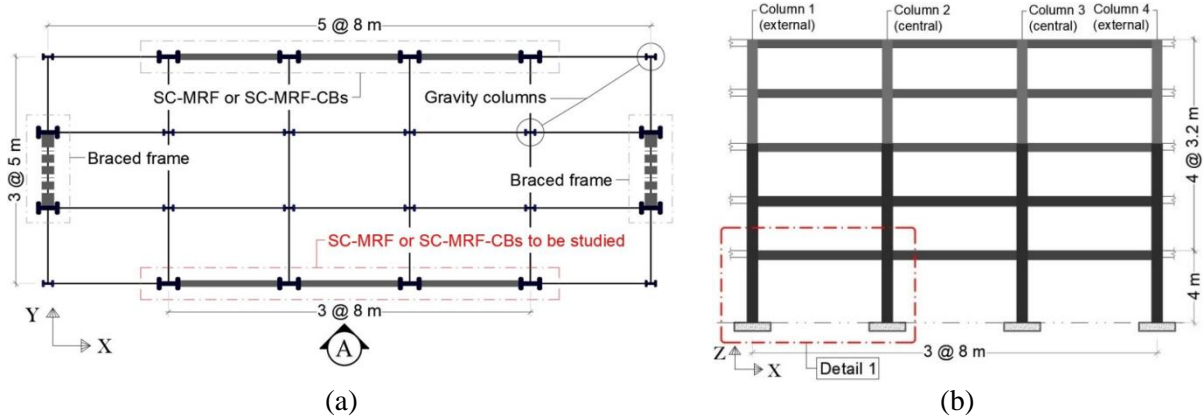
(a) Plan view; and (b) Elevation A of the prototype building.
